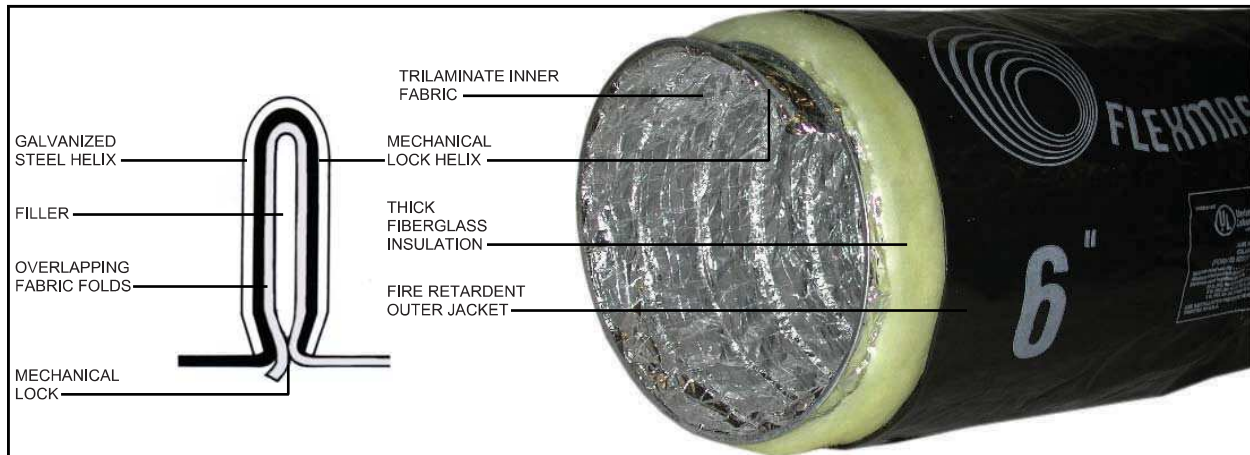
CEILING DIFFUSER BRANCH DUCTS
